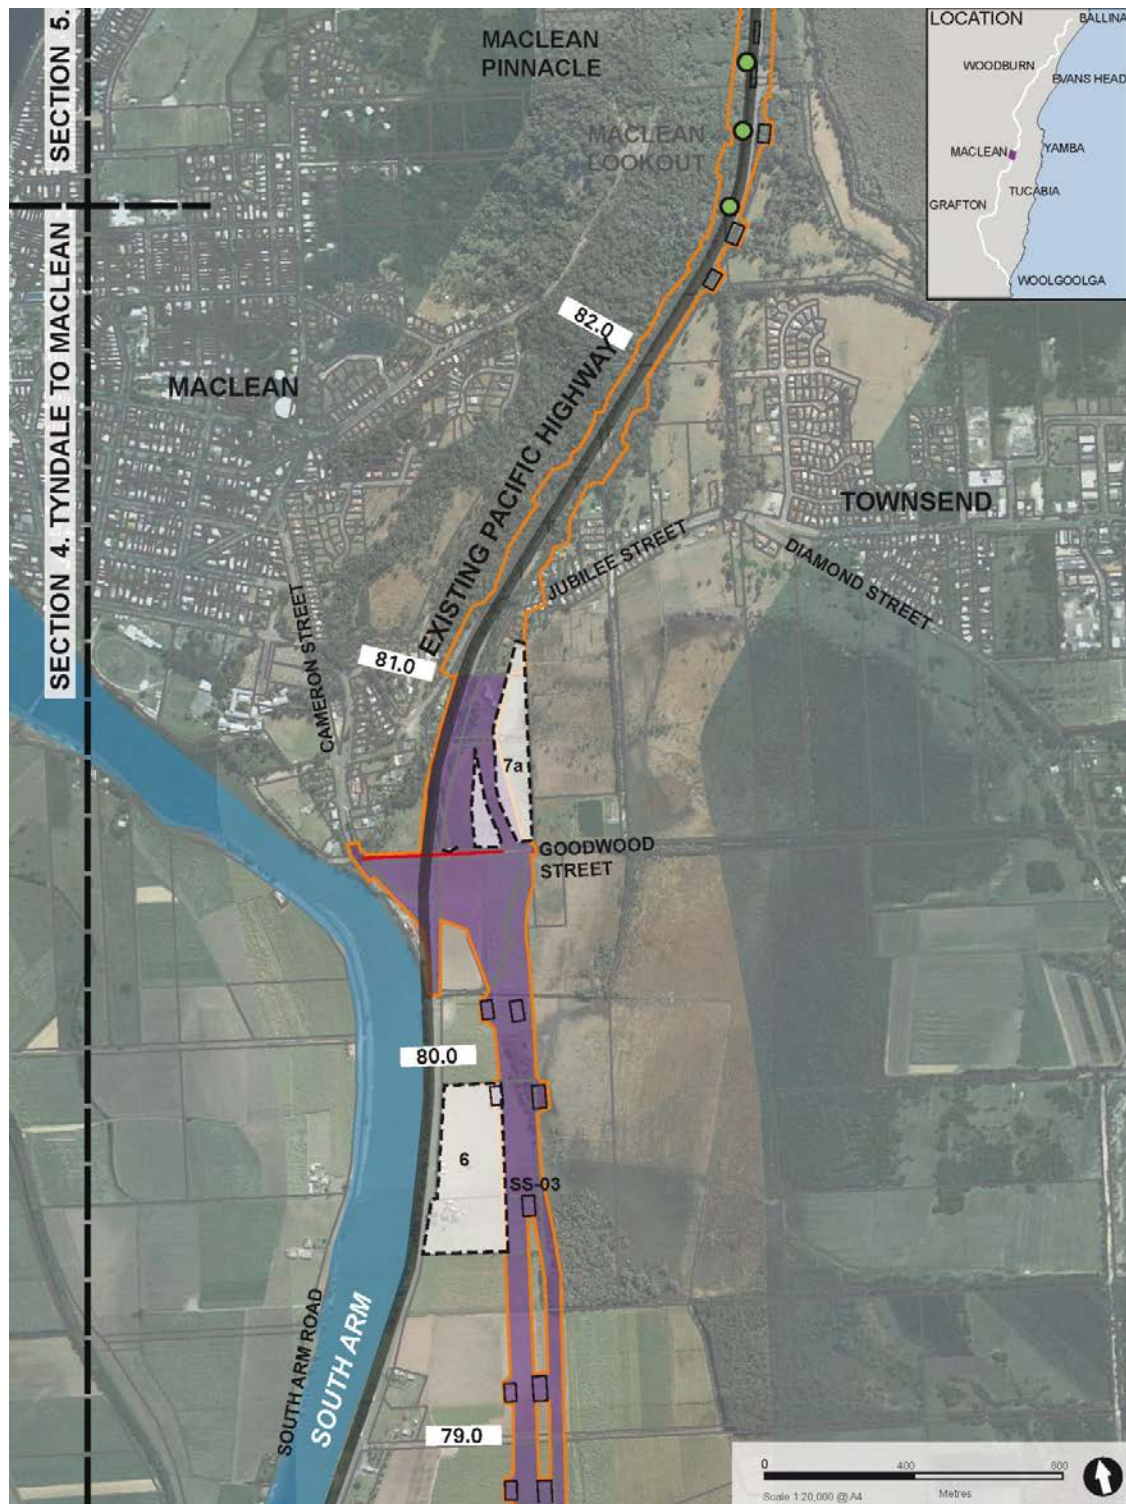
Extent of construction and construction features Section 4 (Station 78.9 to 82.9)
